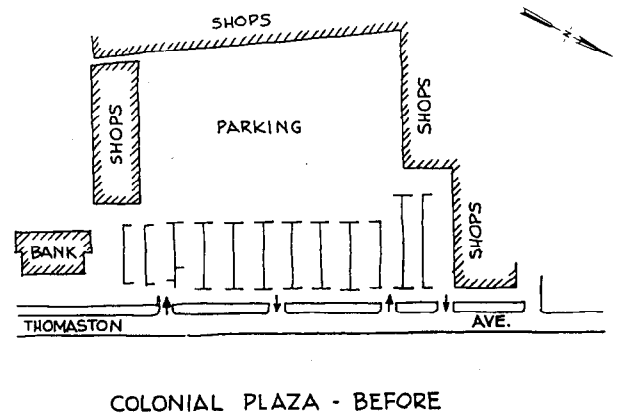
Example of internal site improvements—Colonial Plaza (Source: Benedict G. Barkan, "Retrofitting Shopping Centers for Today's Traffic," Workshop on Access Management, University of Connecticut, 1984)
